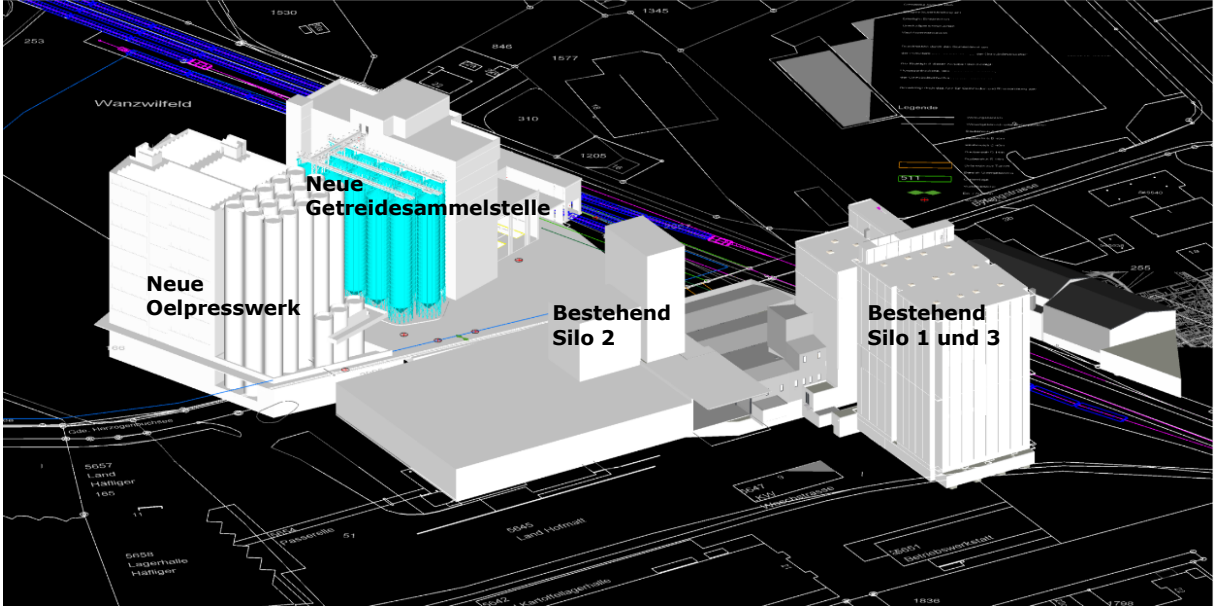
Foreseen plant layout with the new oil pressing plant (Oelpresswerk) and the new grain collection center (Getreidesammelstelle) next to the exiting Biowerk plant.
